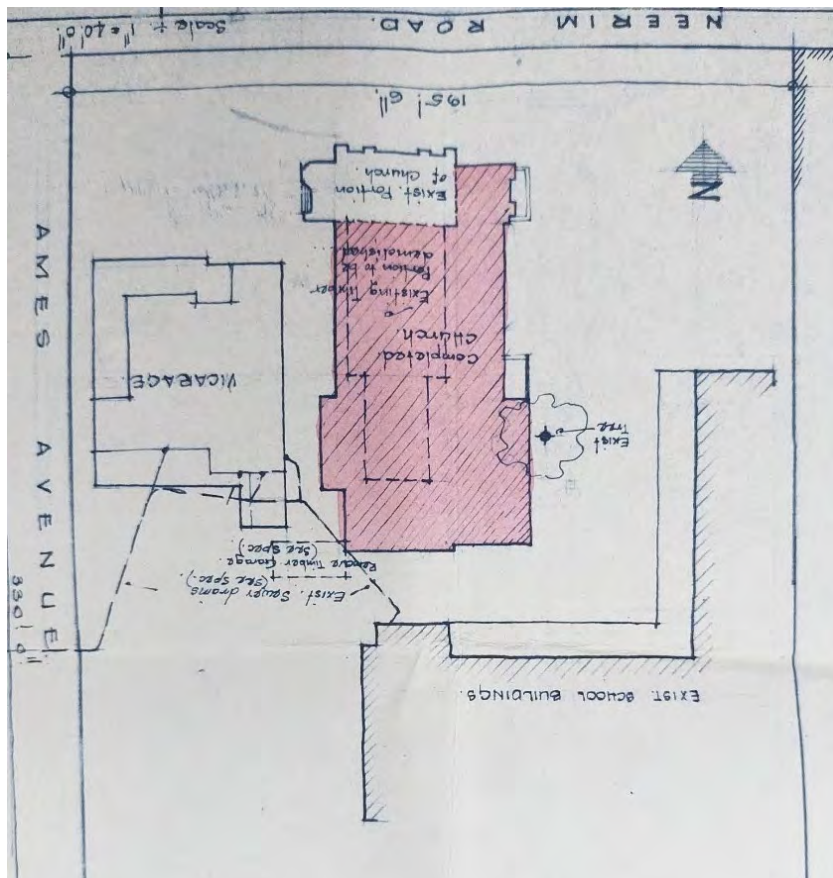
Site plan, 1958, by architect L R Williams. Coloured red is the proposed works for the completion of the church, replacing the earlier timber body (Source: PROV, PB File)
